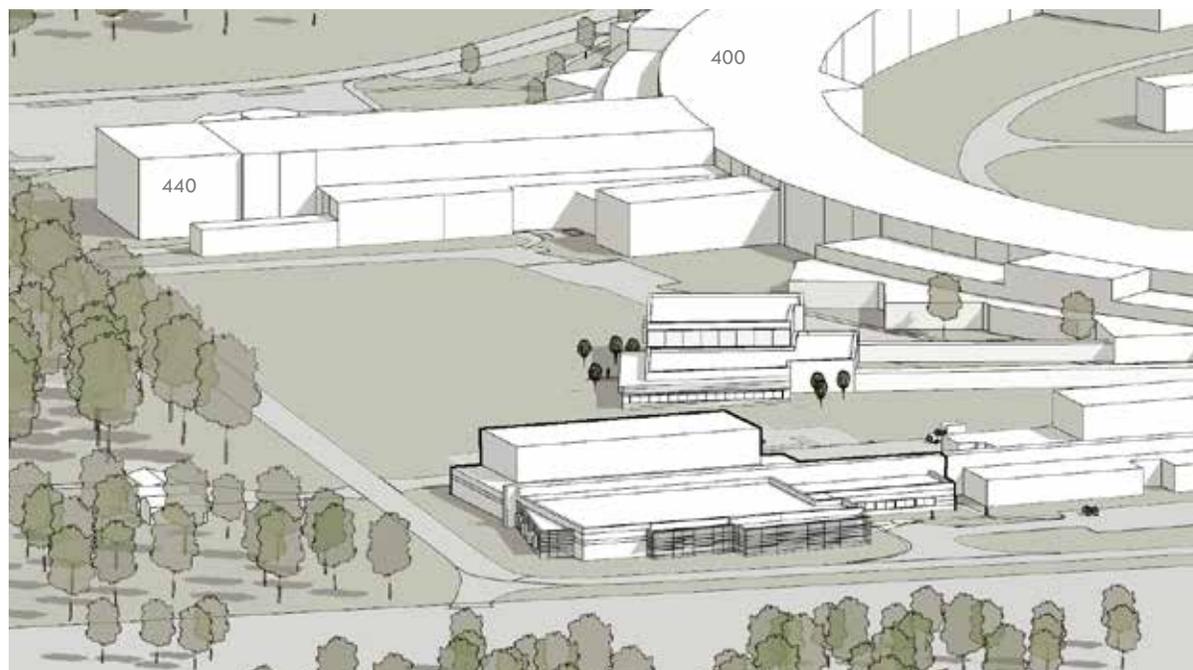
Conceptual View of 400 Area Improvements, Sensing and Imaging at Argonne Facility and APS Long Beamline Building in Background
